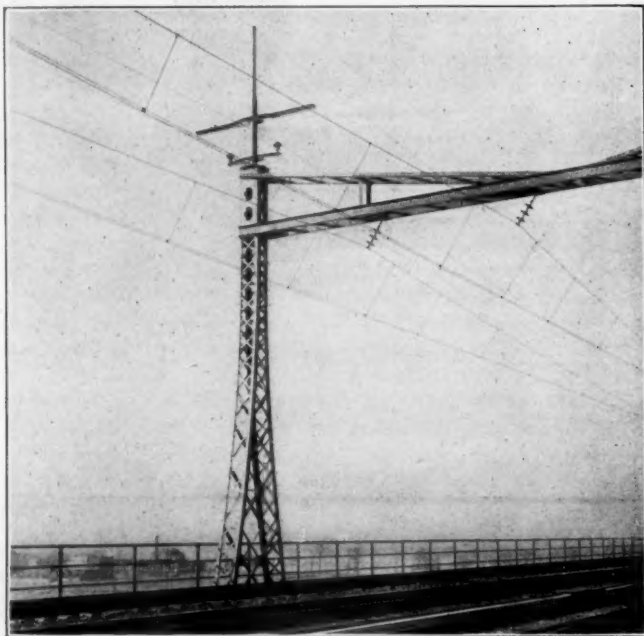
Type of Post Used to Span Bridge Expansion Joints
